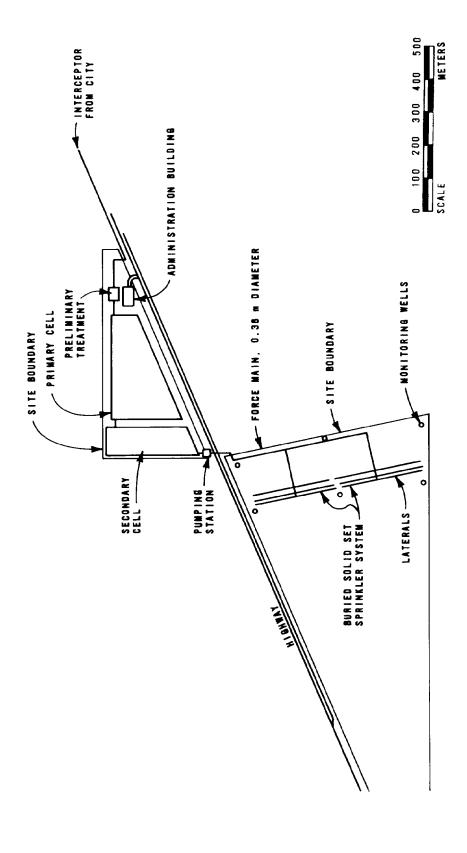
SYSTEM LAYOUT: FOREST CROP ALTERNATIVE
